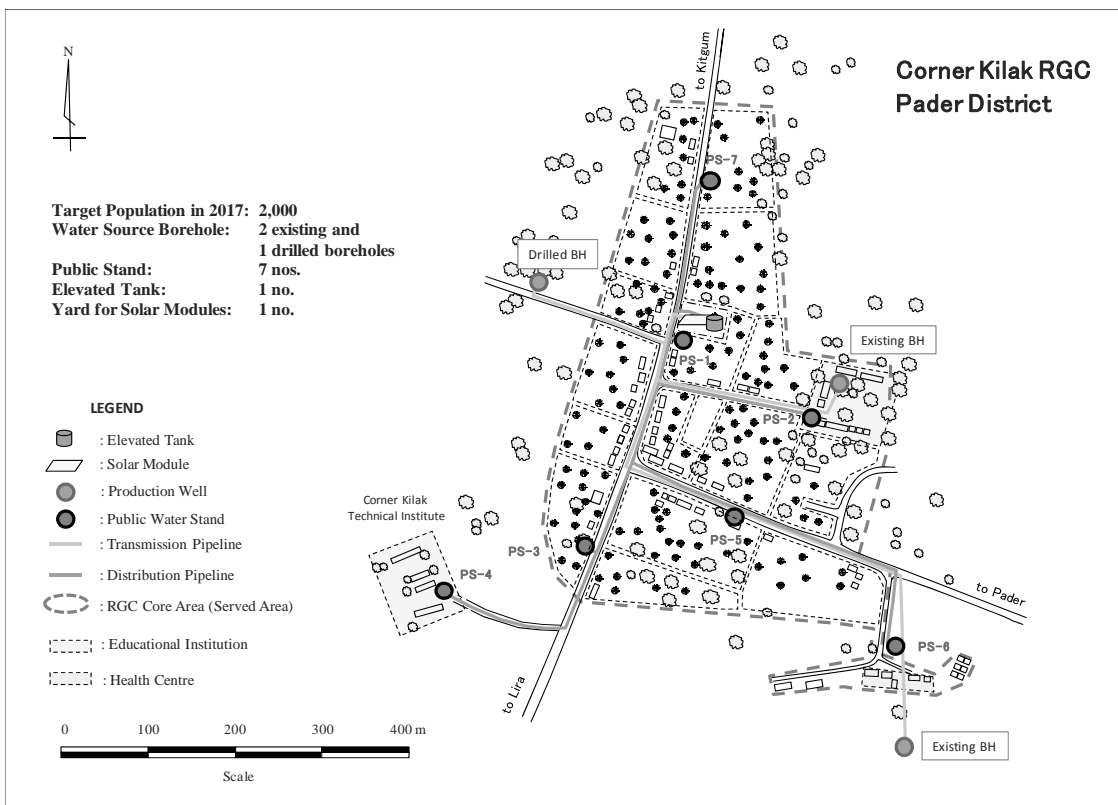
General Plan of Piped Water Supply Facility (Corner Kilak RGC)
